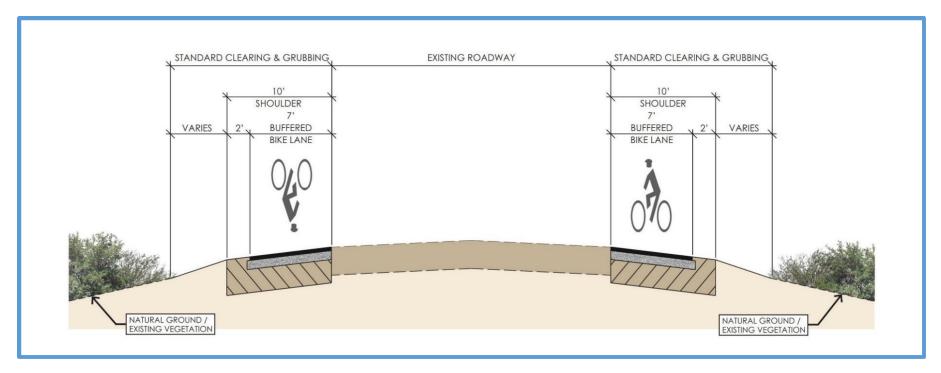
Typical Section, N-S MINWR Alternative 1
